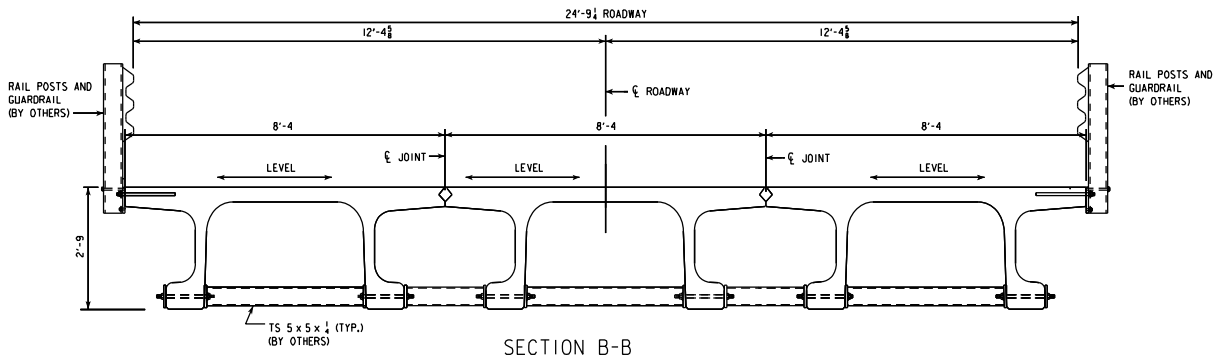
Cross-Section of Center Span-(Keierleber, et al. 2008)
